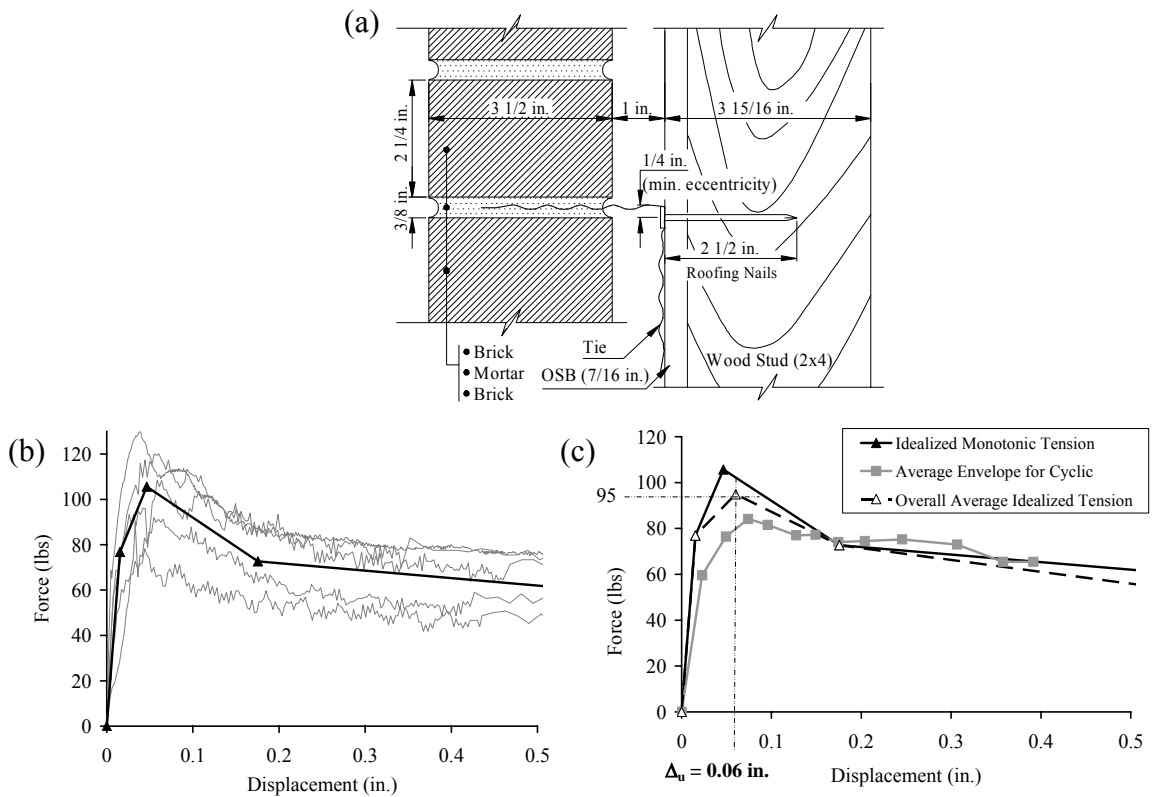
Wall-3 tie connection details: (a) section view of installation; force-displacement behavior under (b) monotonic tension loading, and (c) monotonic tension and cyclic loading.
